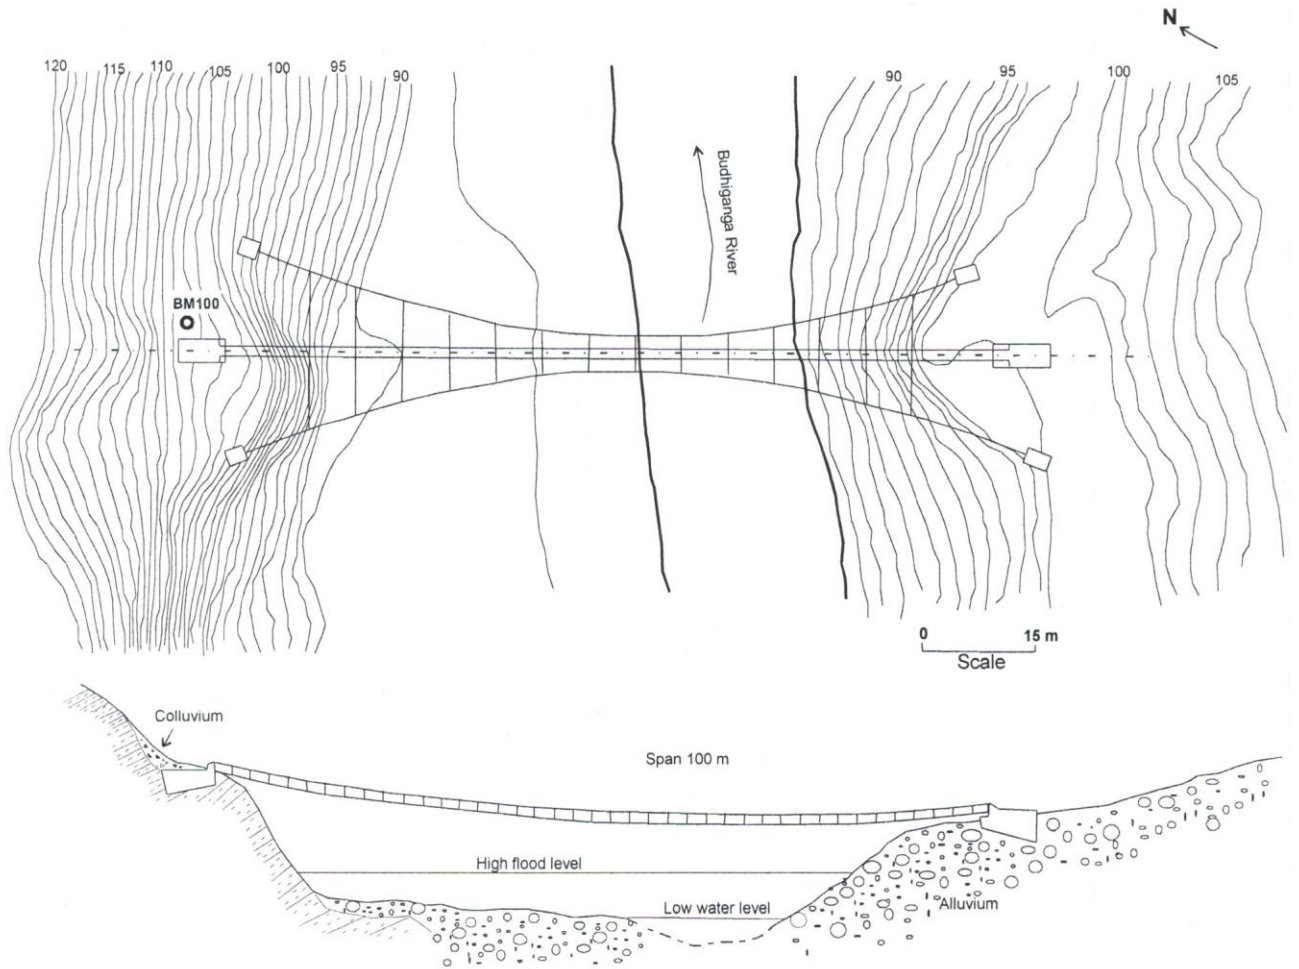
The general layout map and cross section view of the Kailashmandu Bridge (Modified after HEET 1998).
